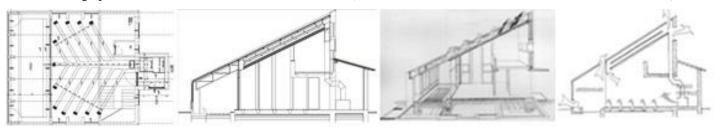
METU Solar House Piping Plan and Section (Ecevit and Demirbilek, 1994; Demirbilek et all, 1997a)
